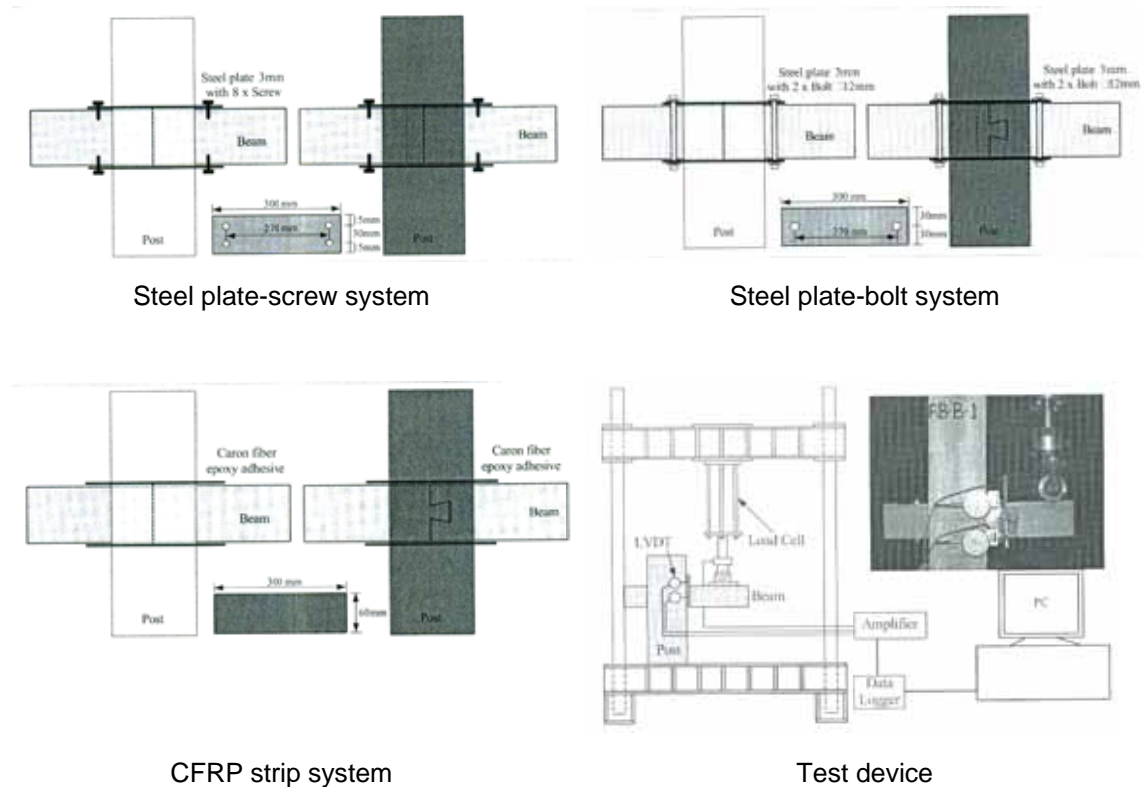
Beam to column strengthening tests (Chen 2008)
